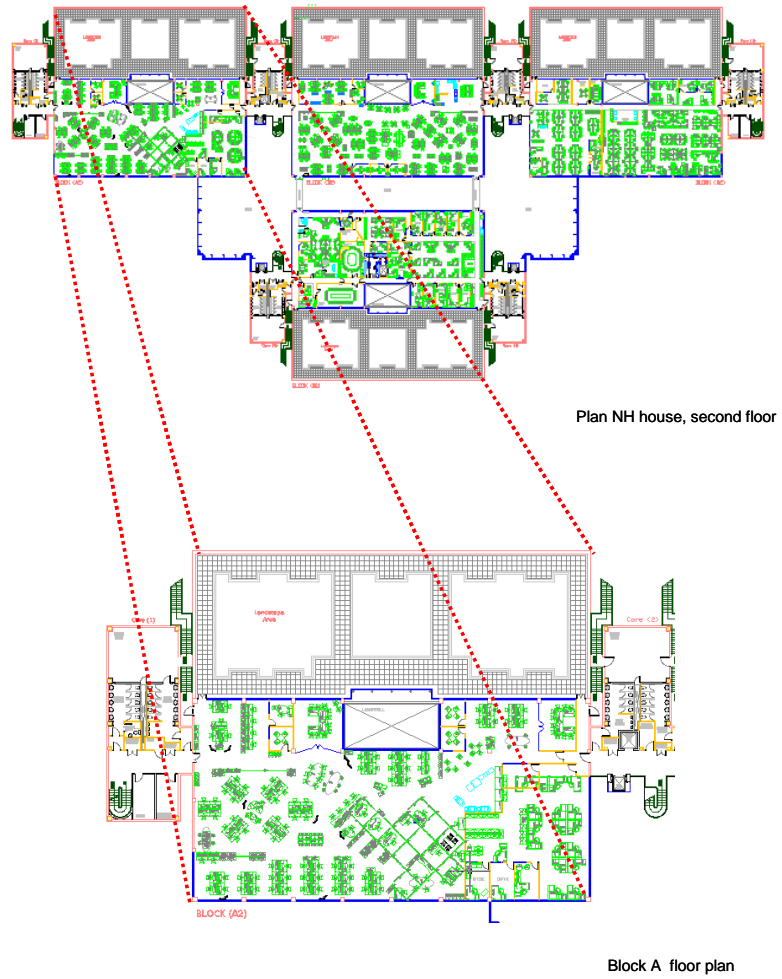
Nationwide house floor plan: Block A highlighted.
